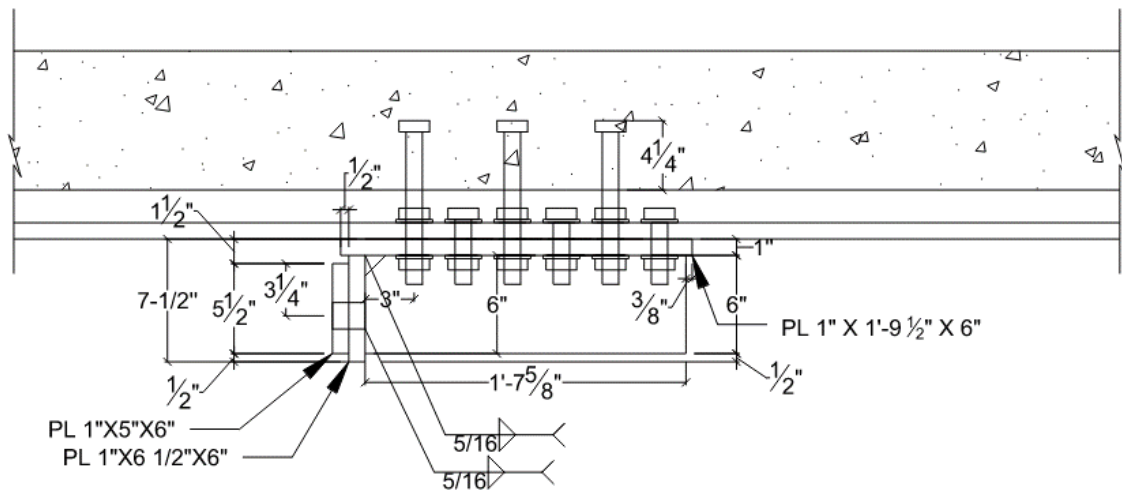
Close-Up Elevation of Steel Bracket Assembly.
